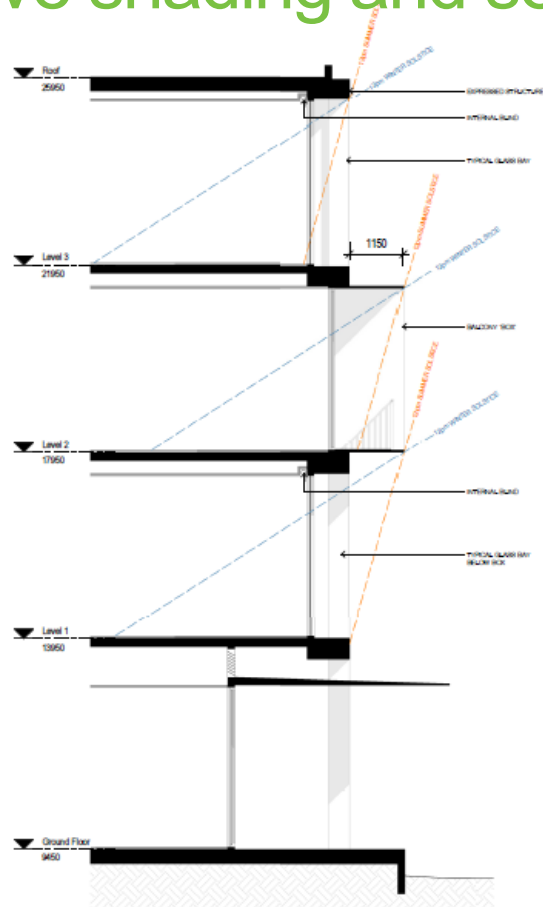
SECTION - North Facade - Fixed Horizontal Shading
